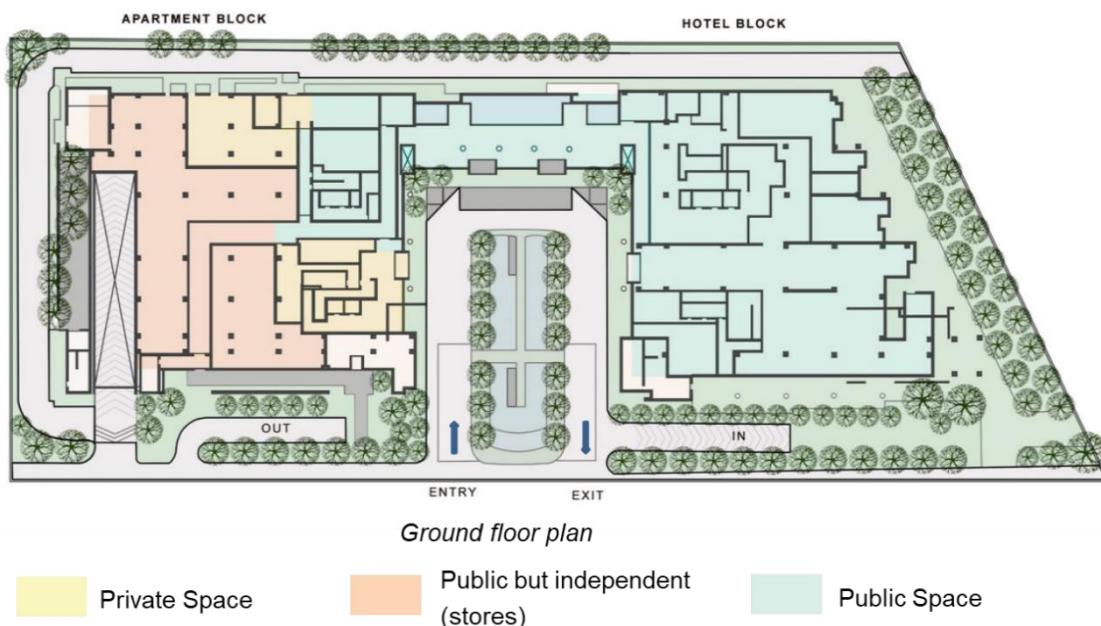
ground floor plan. Source: Shubh Mandal.2022, modify by author :
